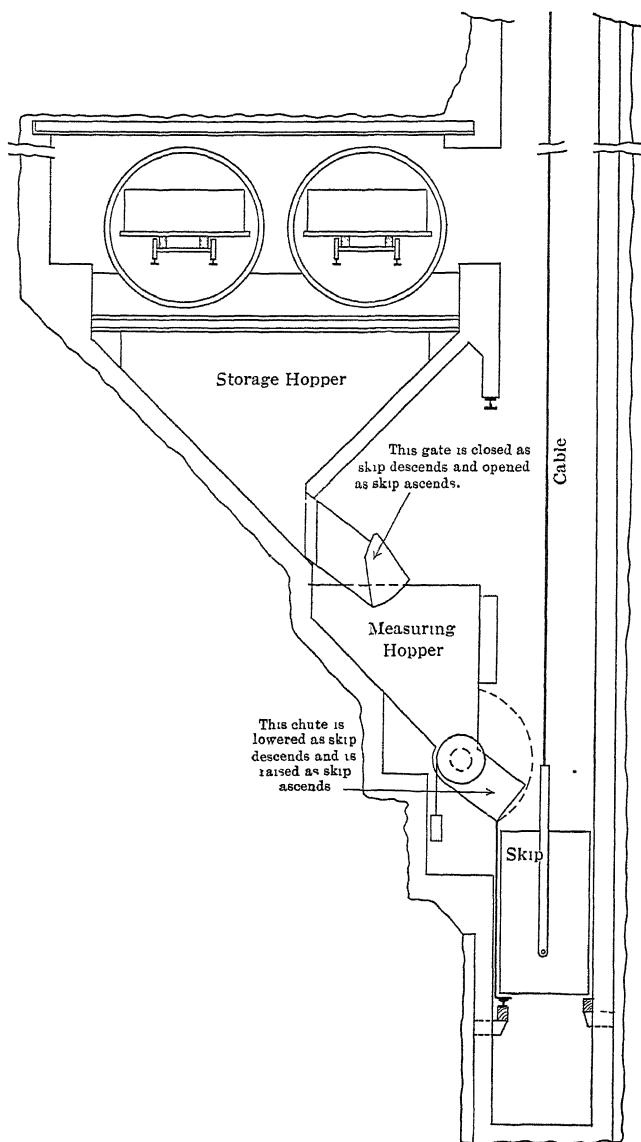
SHAFT BOTTOM DUMPING ARRANGEMENT, STANDARD OIL CO.
